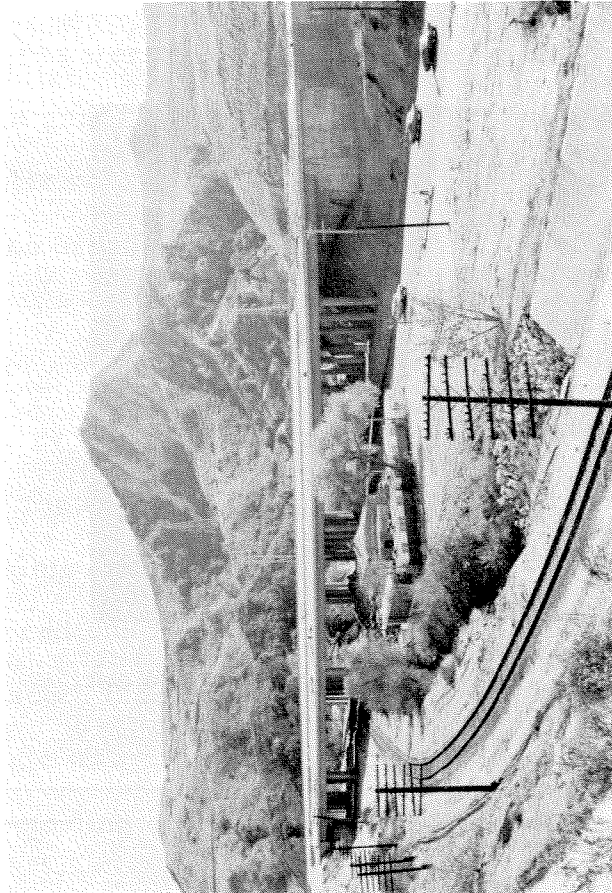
Looking southwest at the West Sylmar Overhead, north of Balboa Street on the Golden State freeway.
